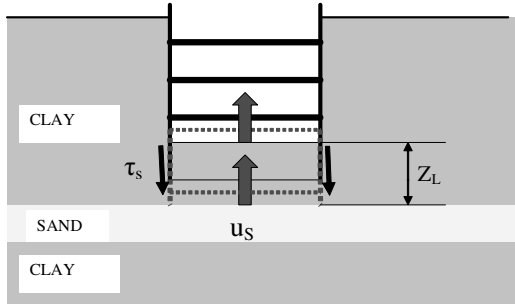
Illustration of hydraulic plug uplift failure from confined sand layer.
